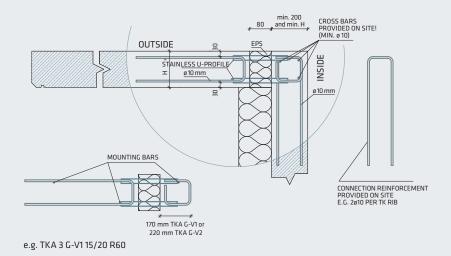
Balcony connection – wall below with TKA G-V1 or V2
